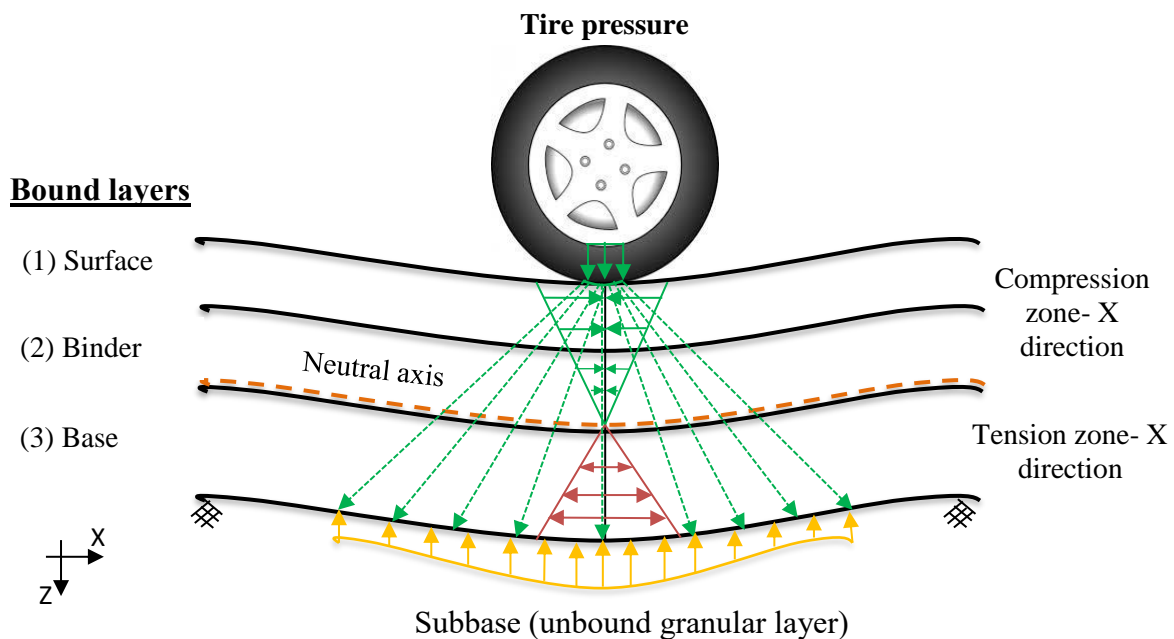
1: Schematic representation of stress/strain distribution in a typical flexible pavement structure
